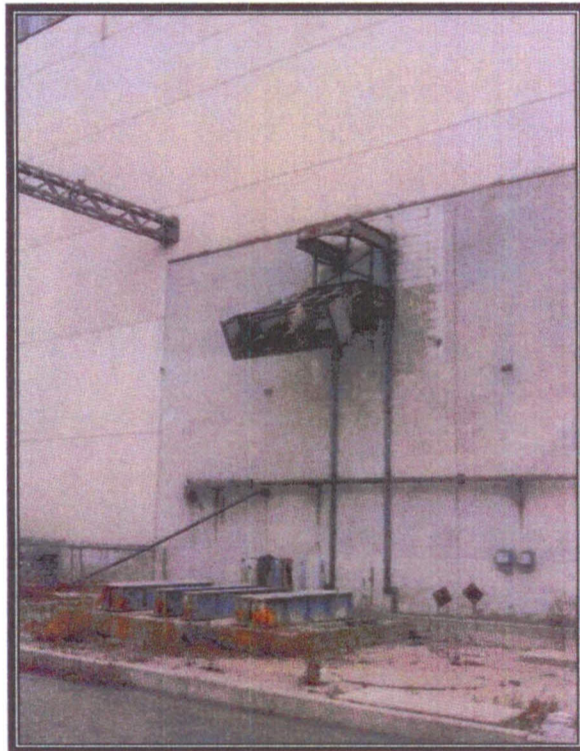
Concrete block wall section at transformer pad (Photograph by RCG&A, 2008)
